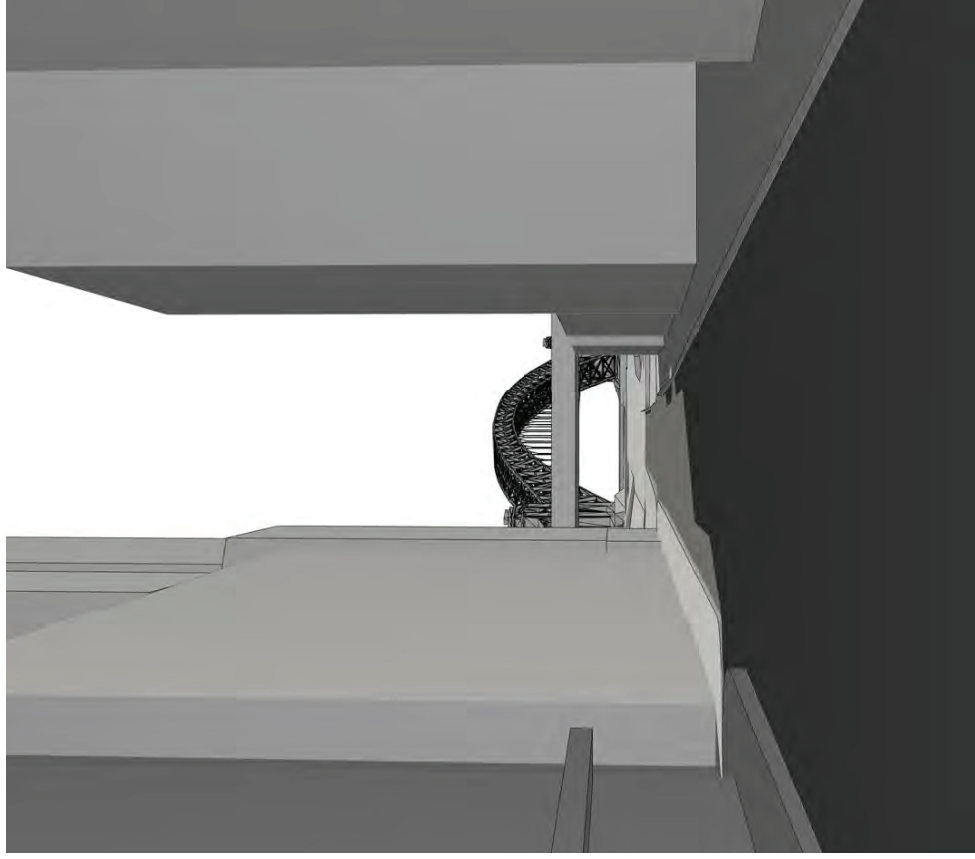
View from Model - Current with 33-35 Pitt Street DA Stage 2.
